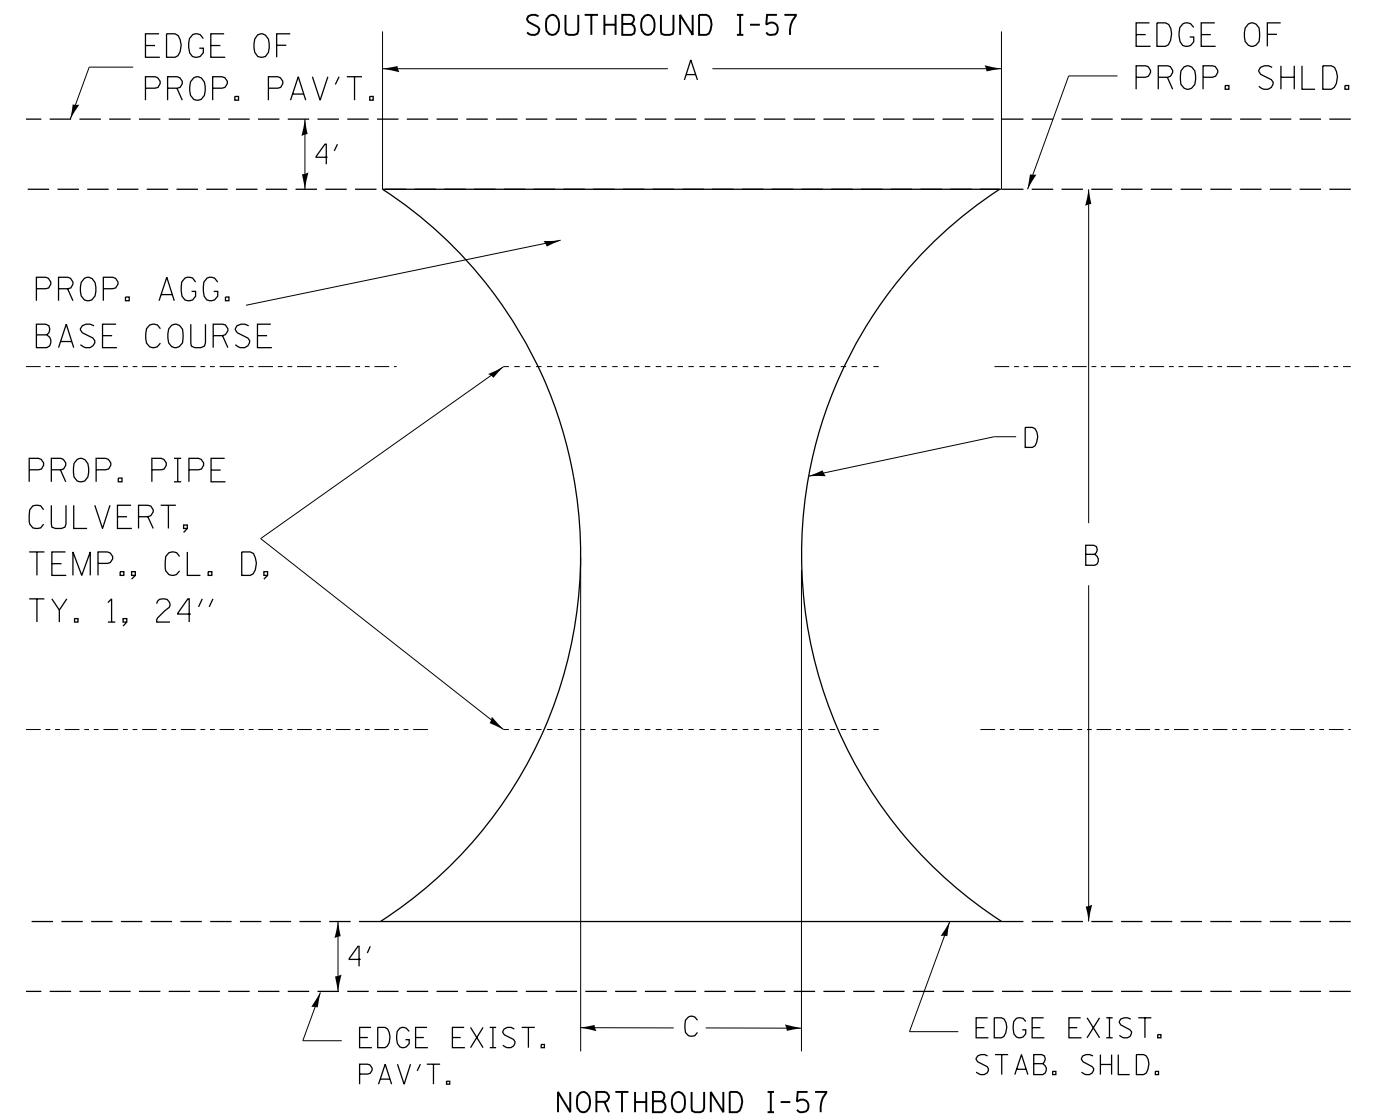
DETAIL OF EMERGENCY MEDIAN TURN AROUND SINGLE DITCH MEDIAN PLAN VIEW
